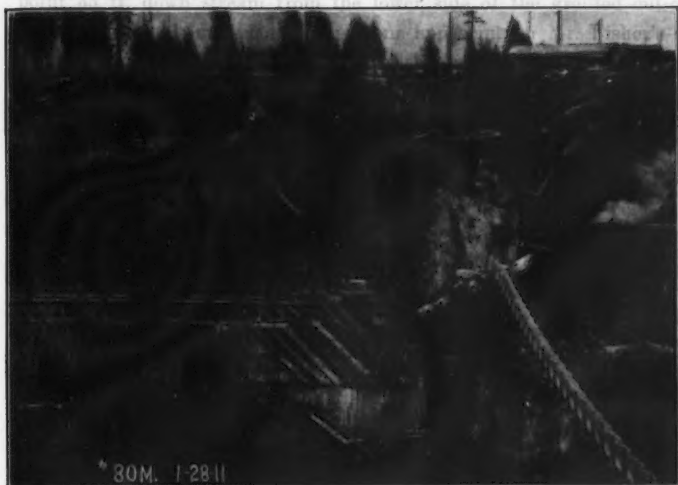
VIEW FROM LEFT BANK. ISLAND BEING CUT TO SLOPE OF DAM.
